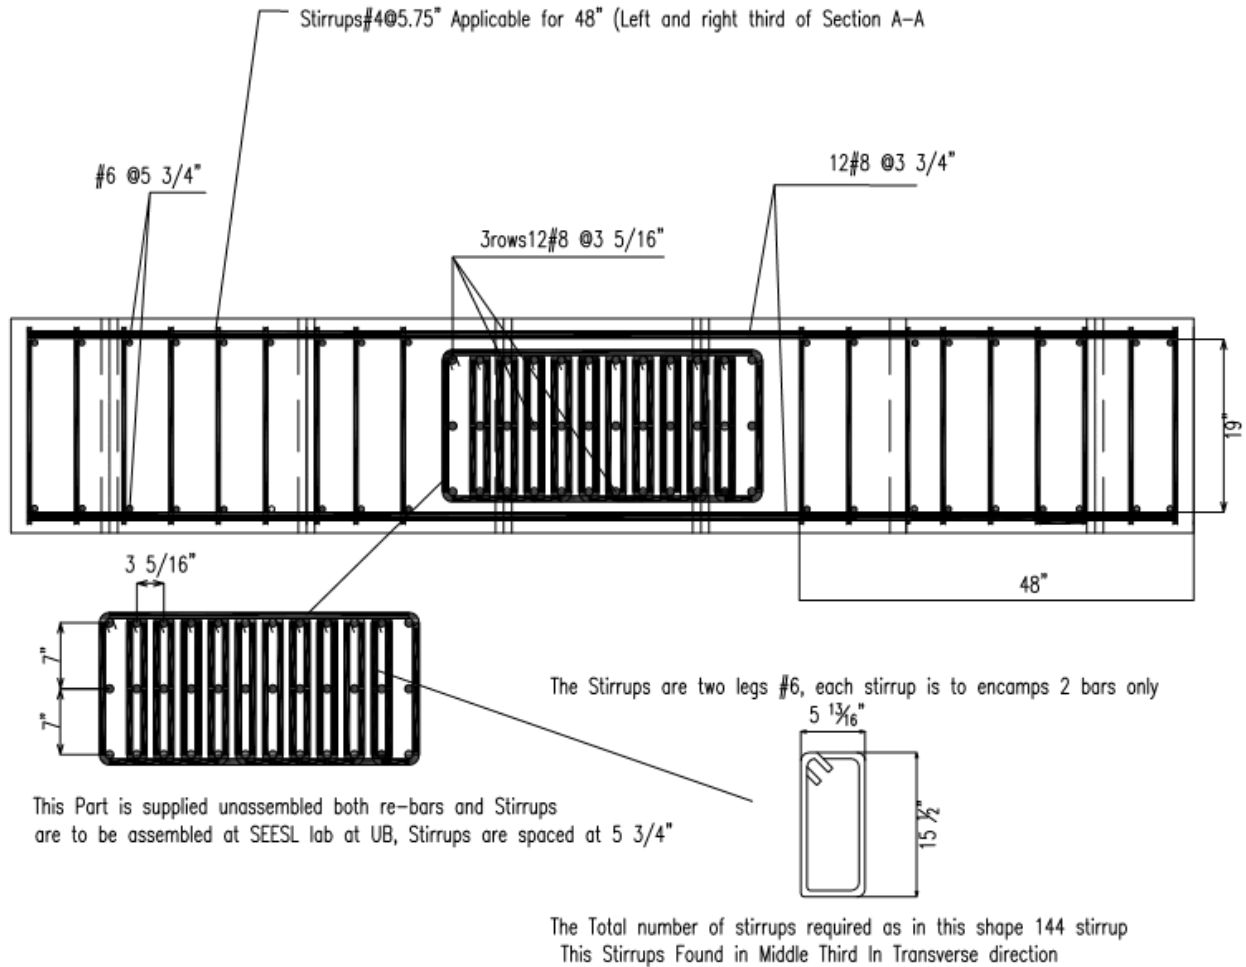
Re-bars Used to Transfer the Web Forces and Foundation Reinforcement
